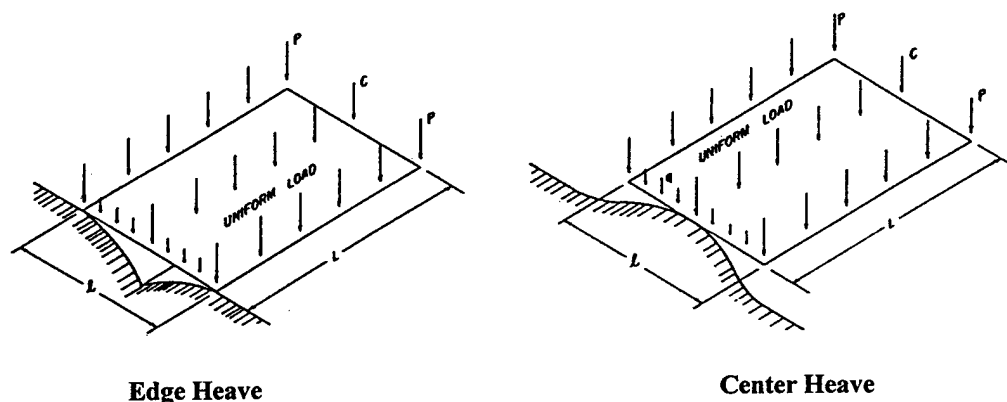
(Lytton 1973) Edge Heave and Center Heave Distortion Modes
